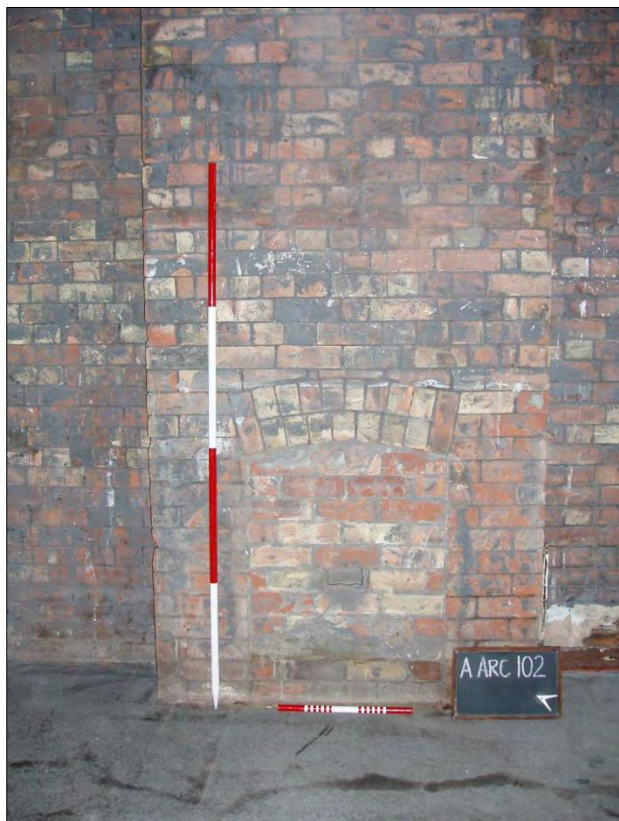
West Facing View of Fabric of Public House. Flemish Bond (Scales 1 x 2m & 1 x 1m)
